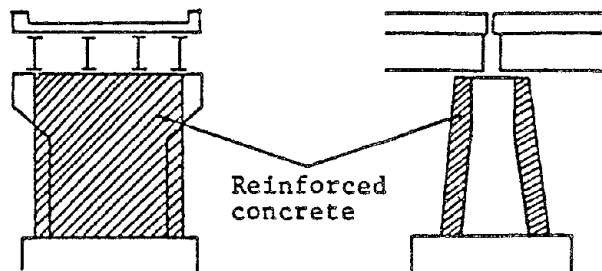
Wrapping with Reinforced concrete ⁷⁾
